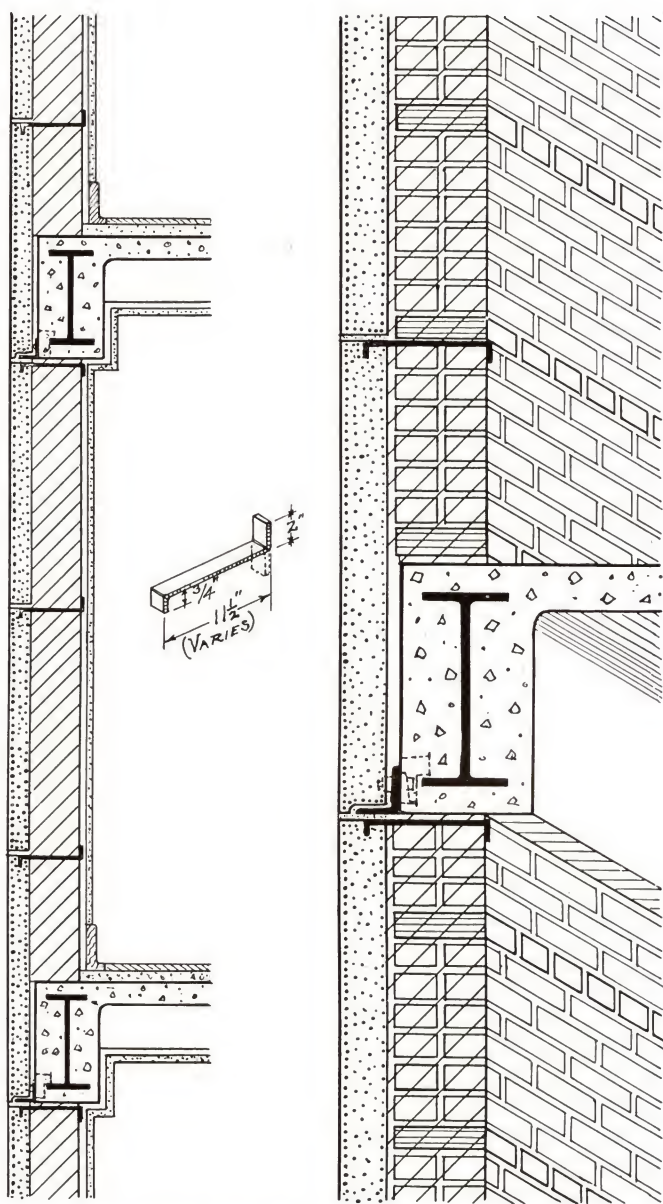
Stone facings supported by shelf angles anchored to backing and to structural frame.
